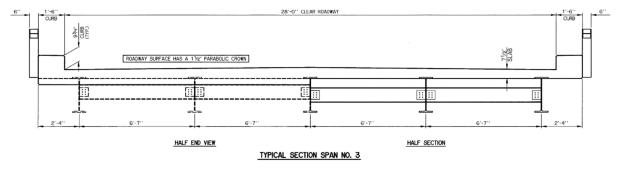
Existing Cross Section – NBI 15089. Note that this is taken from Standard IB-5-31, and the bridge rail was at some point Replaced with a concrete bridge barrier.
